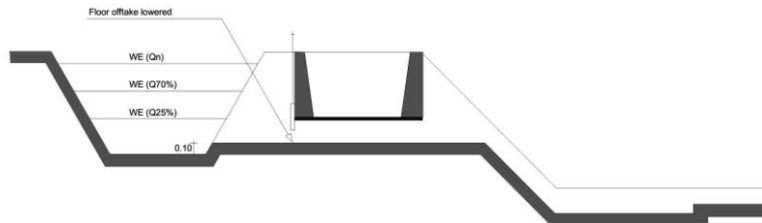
Base floor of off take structure is lowered when to be 0.10 m above base floor of main canal, so when occurred small discharge, water still enter to offtake structure, so farmer not anymore illegal abstract water
